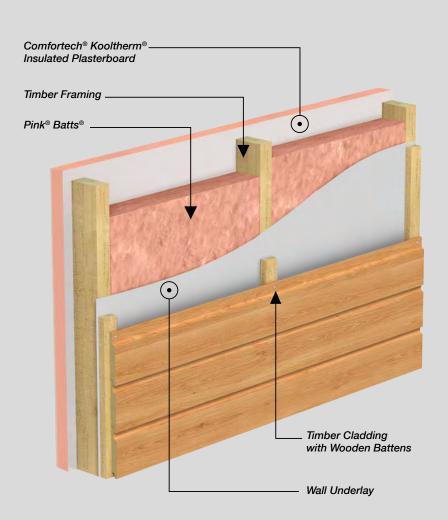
Comfortech® Kooltherm® Insulated Plasterboard lining on a timber framed wall.
